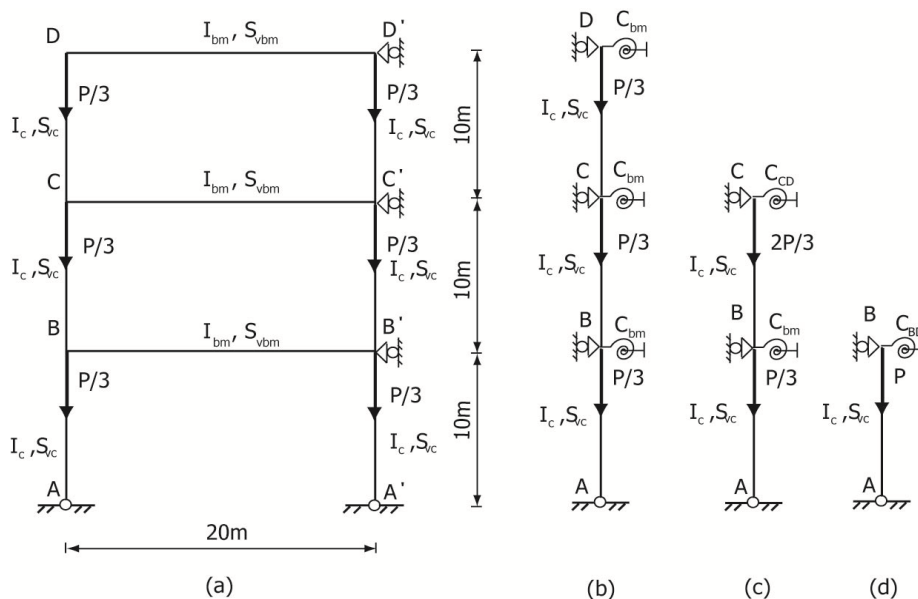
(a) Example 1: Three-story braced frame with rigid beam-column connections, (b) Model "a", (c) Model "b" and (d) Model "c"
